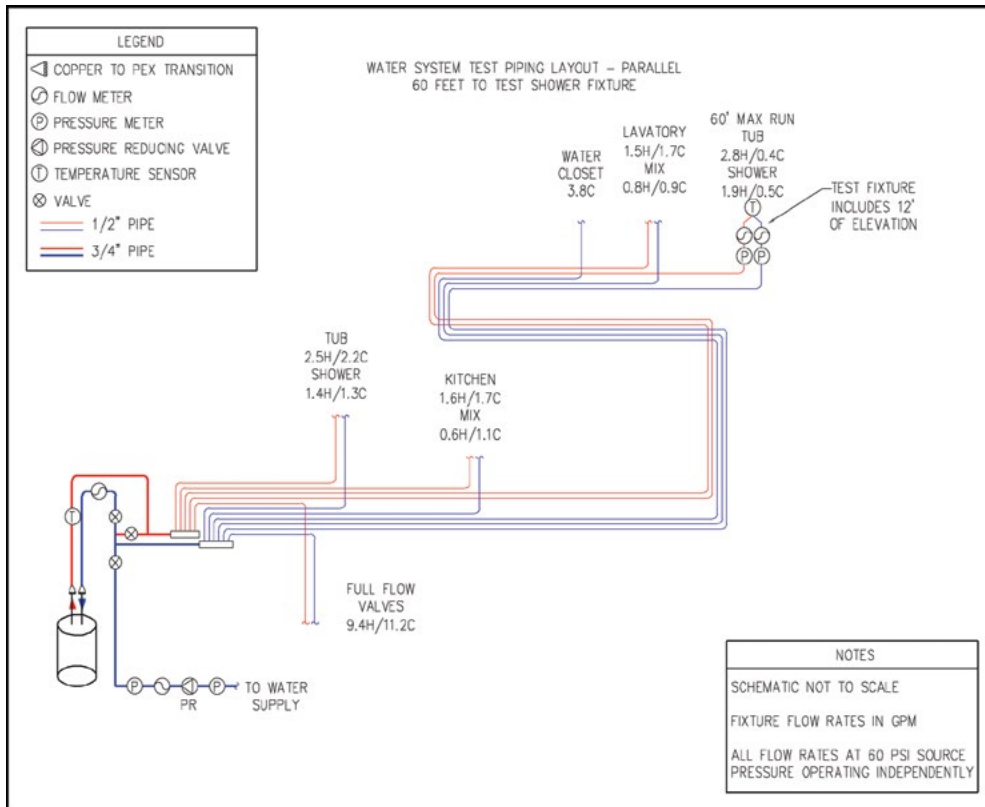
Water System Test Piping Layout – Parallel, 60' to TF
